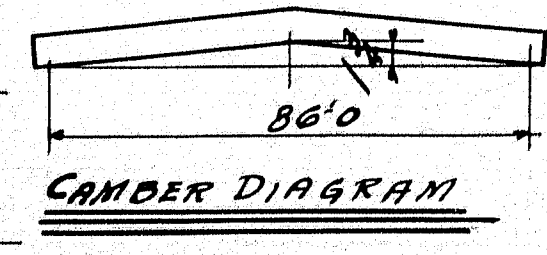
G¹ AS SHOWN & NOTED
